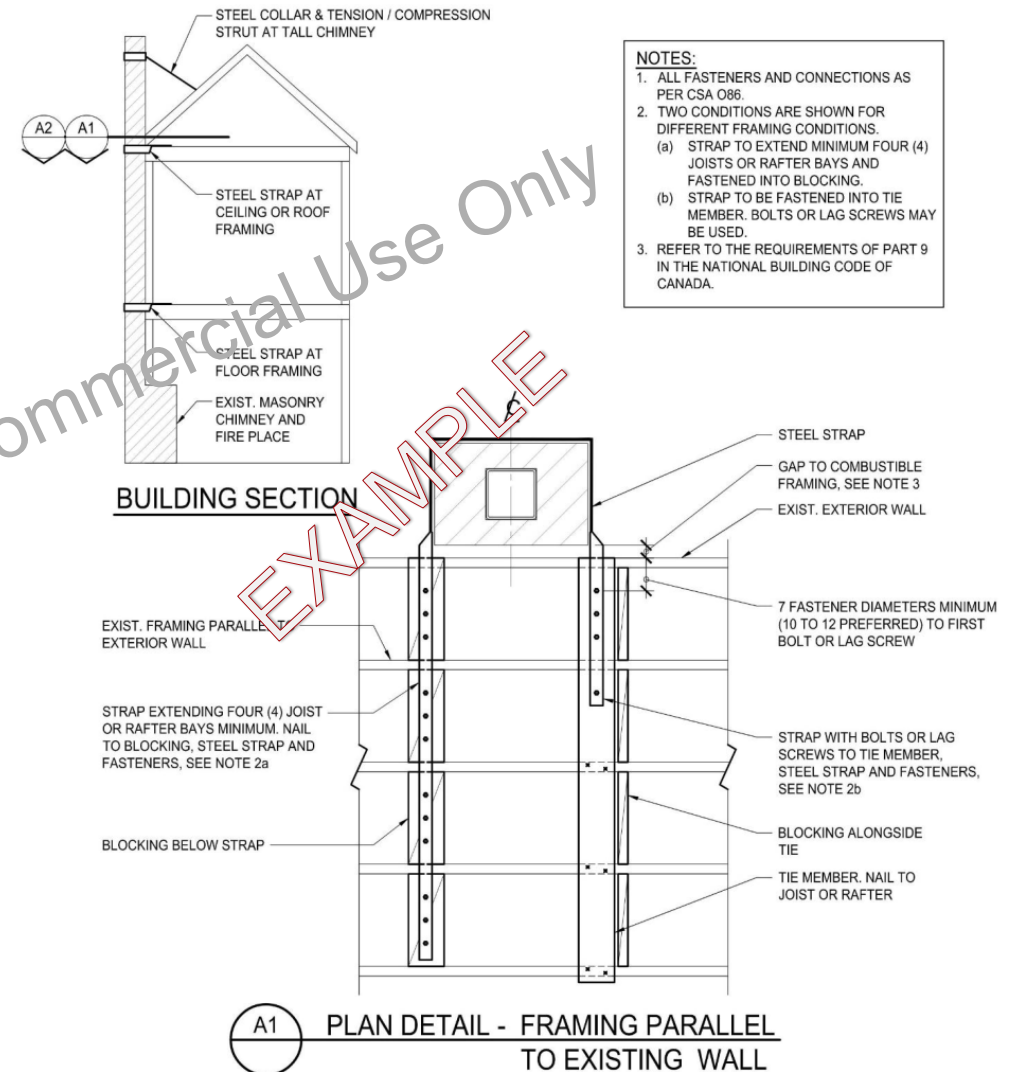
Bracing of URM chimney – framing parallel to wall
